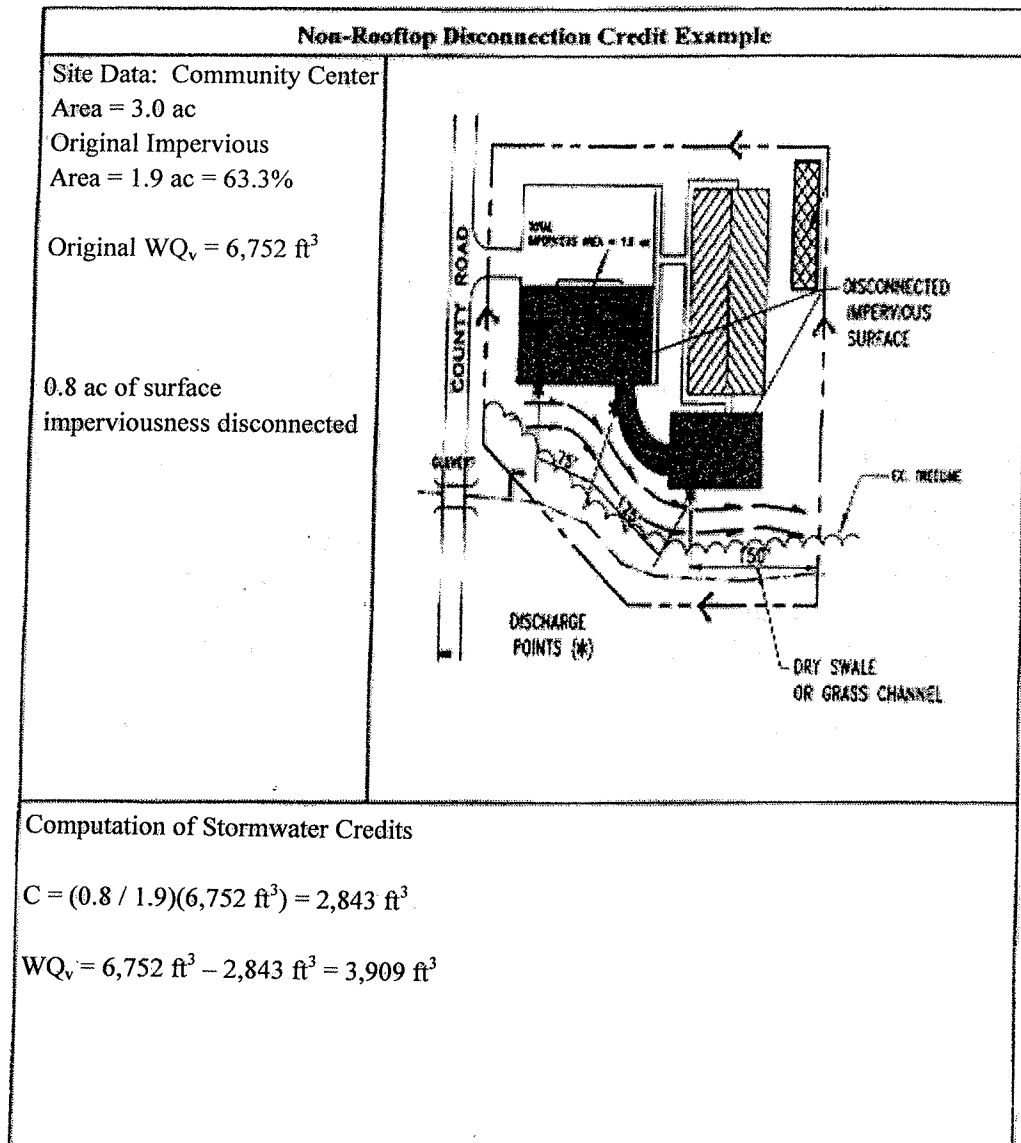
Example, Non-Rooftop Disconnection Credit.
